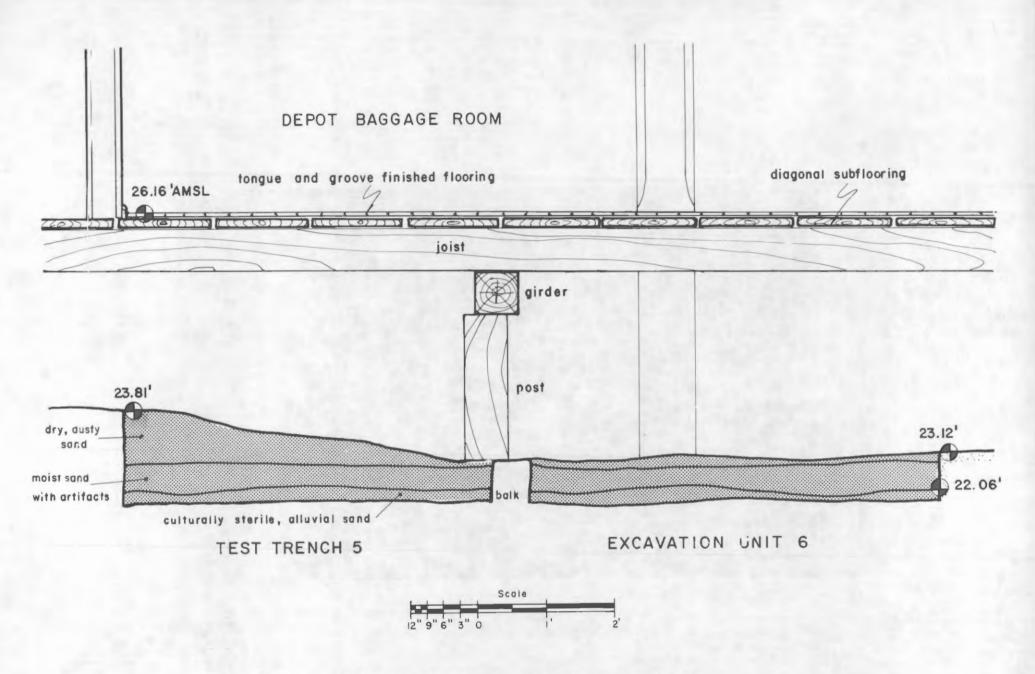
Fig. II: East profile of Test Trench 5 and Excavation Unit 6
